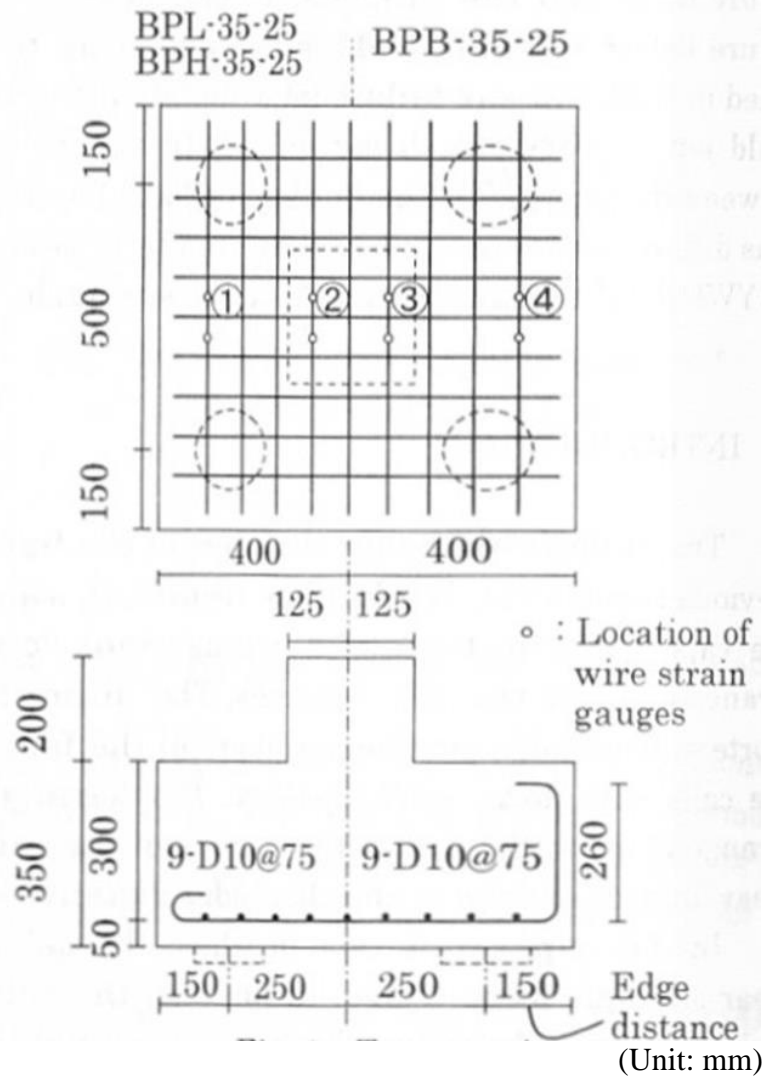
Dimension and details of test specimens (Suzuki and Otsuki, 2002)
